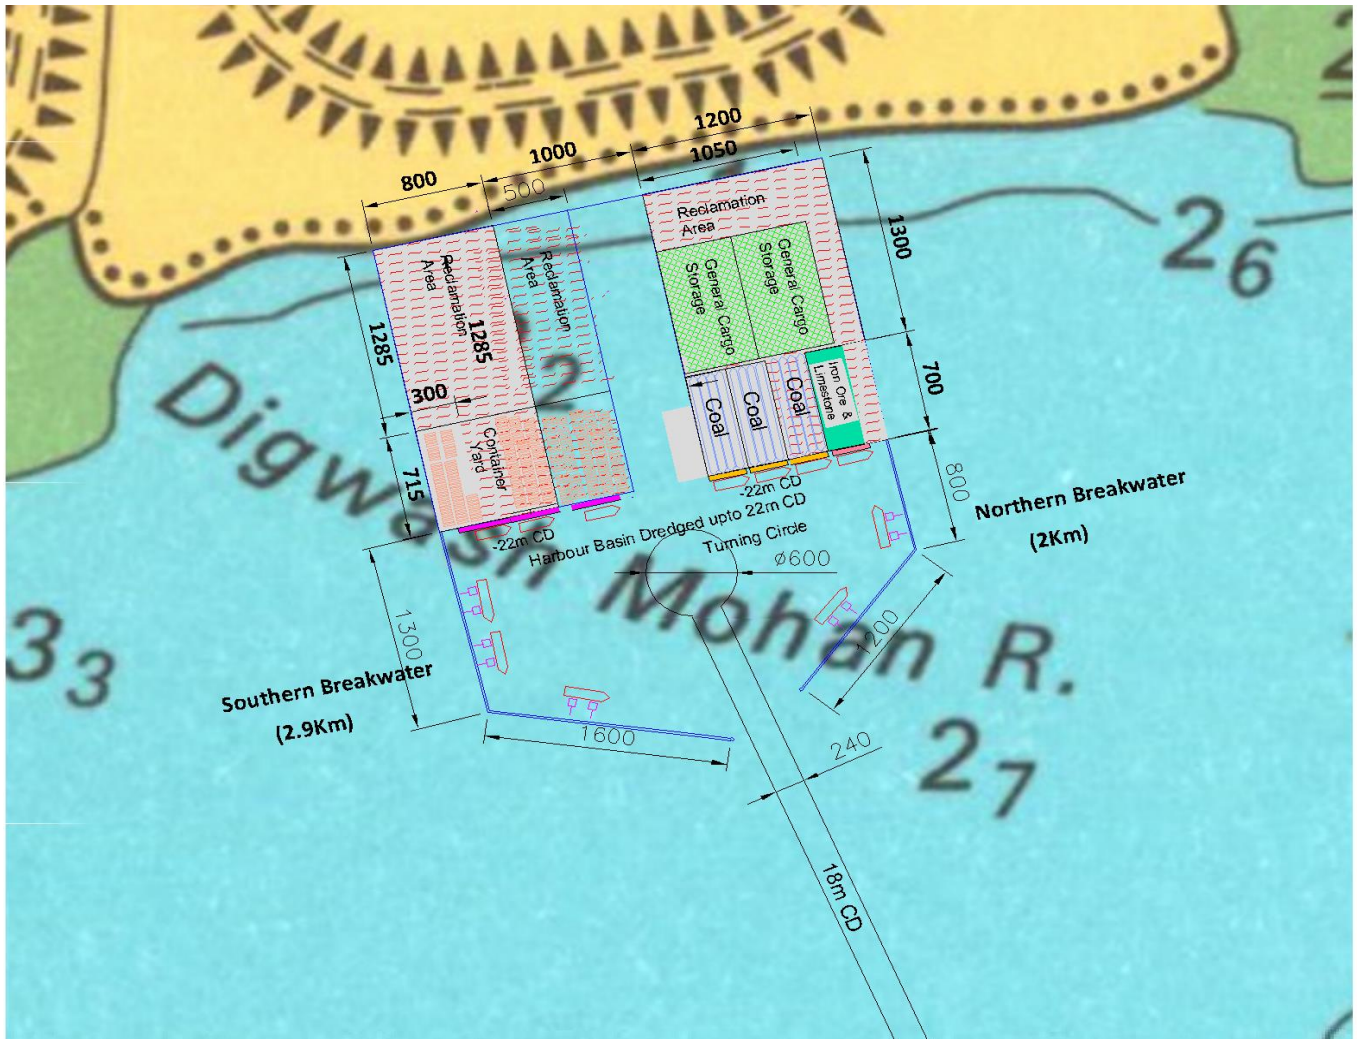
Proposed Layout Master Plan (Showing Oil Berths along the breakwater)
